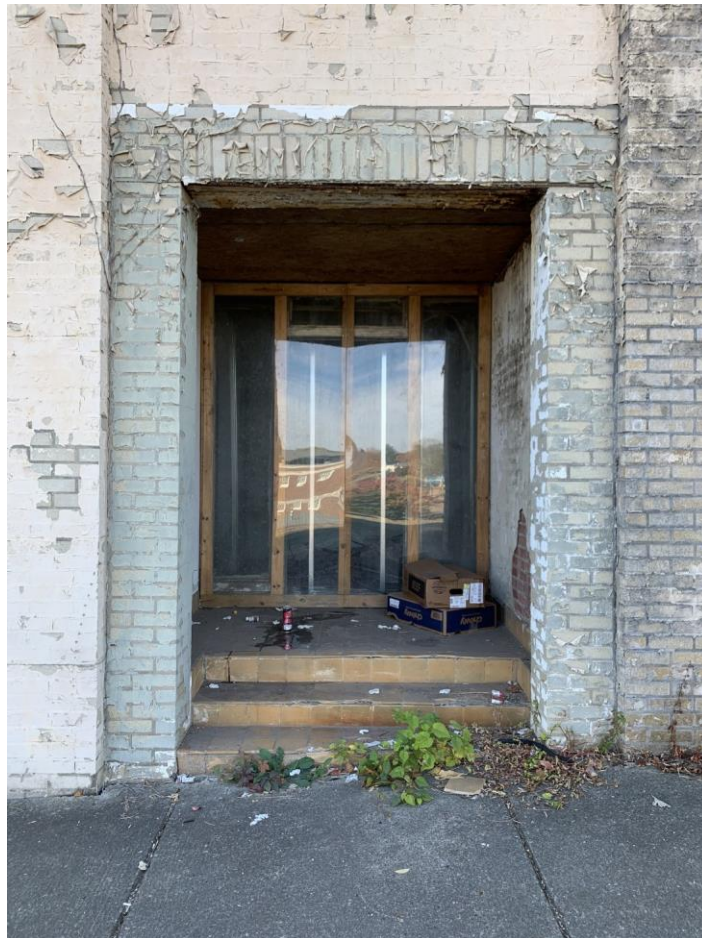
, East elevation, Inset N. Henry Street Entryway on later addition
